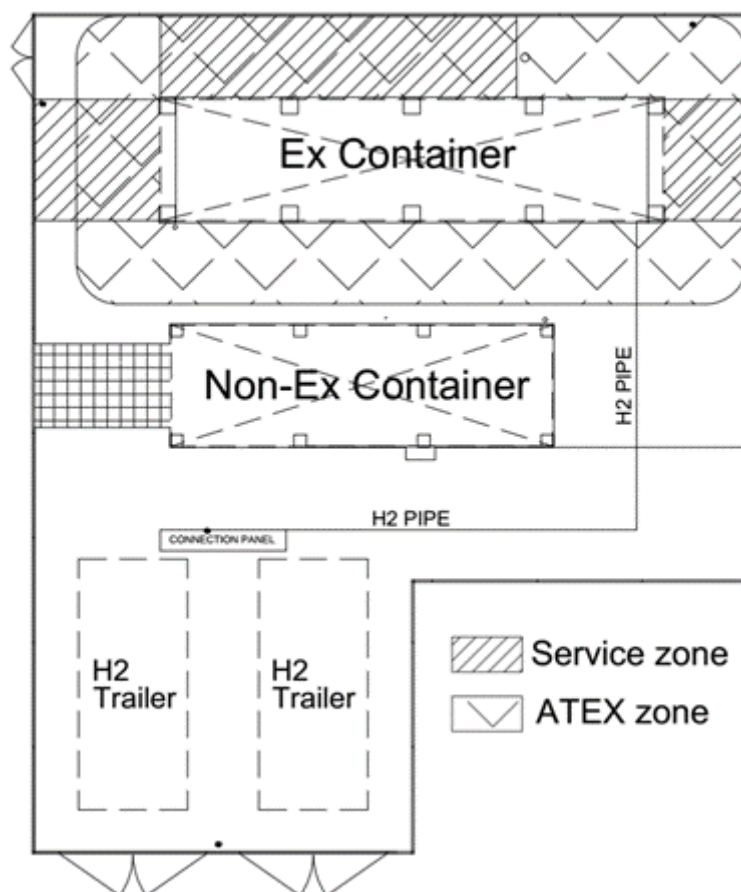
Schematic plan of the hydrogen plant at Hellisheidi
